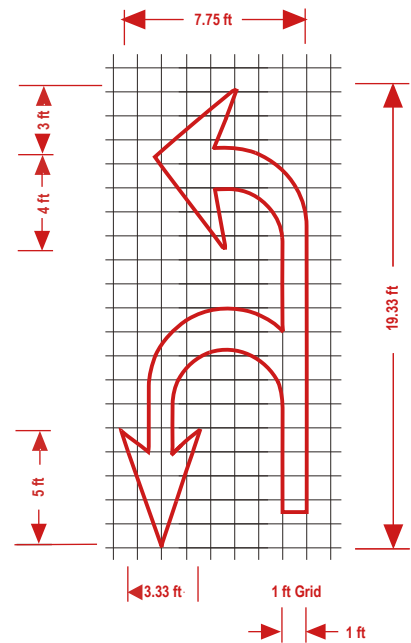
B-24 (CA). Examples of Standard Arrows for Pavement Markings (Sheet 2 of 8)
